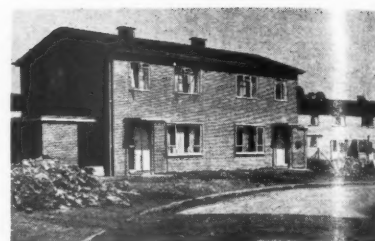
A 'Brick-Modern' House at Slough. Development of the traditional cavity brick wall using prefabrication methods. Walls: 4½ in. brick outer leaf, 2 in. air space, 3 in. breeze blocks, ½ in. plaster, giving U=0.26. (Alternative: 4½ in. brick outer leaf, 2 in. air space, but with 3 in. foamed slag, giving U=0.22. Second alternative: 4½ in. brick outer leaf, 2 in. air space, but with 4 in. foamed slag, giving U=0.19.) Roof: pitched, with steel trusses and purlins, asbestos cement sheeting, ceiling of ½ in. plasterboard and 1 in. glass wool, giving U=0.17. Ground floor: r.c. raft 6 in. thick, with ½ in. thick pitch-mastic on floor, giving U=0.2
